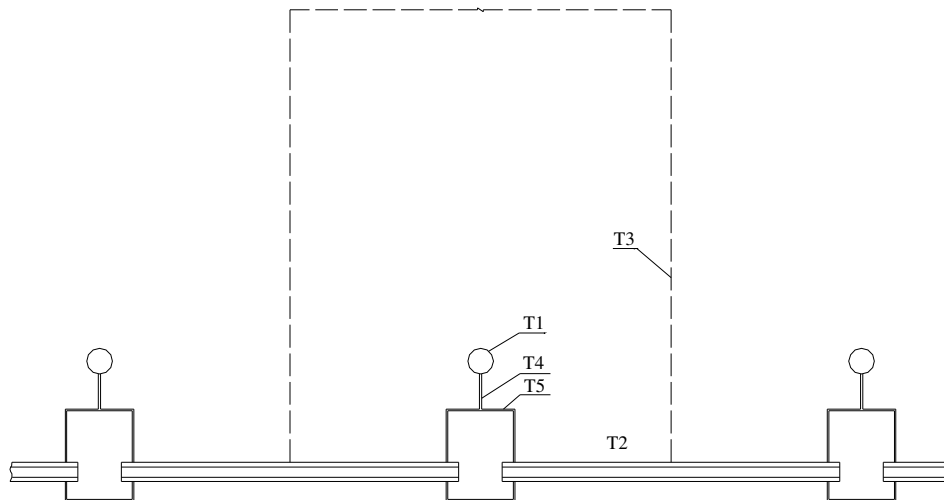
Window Mullion, Frame, and Glass (not to scale)
